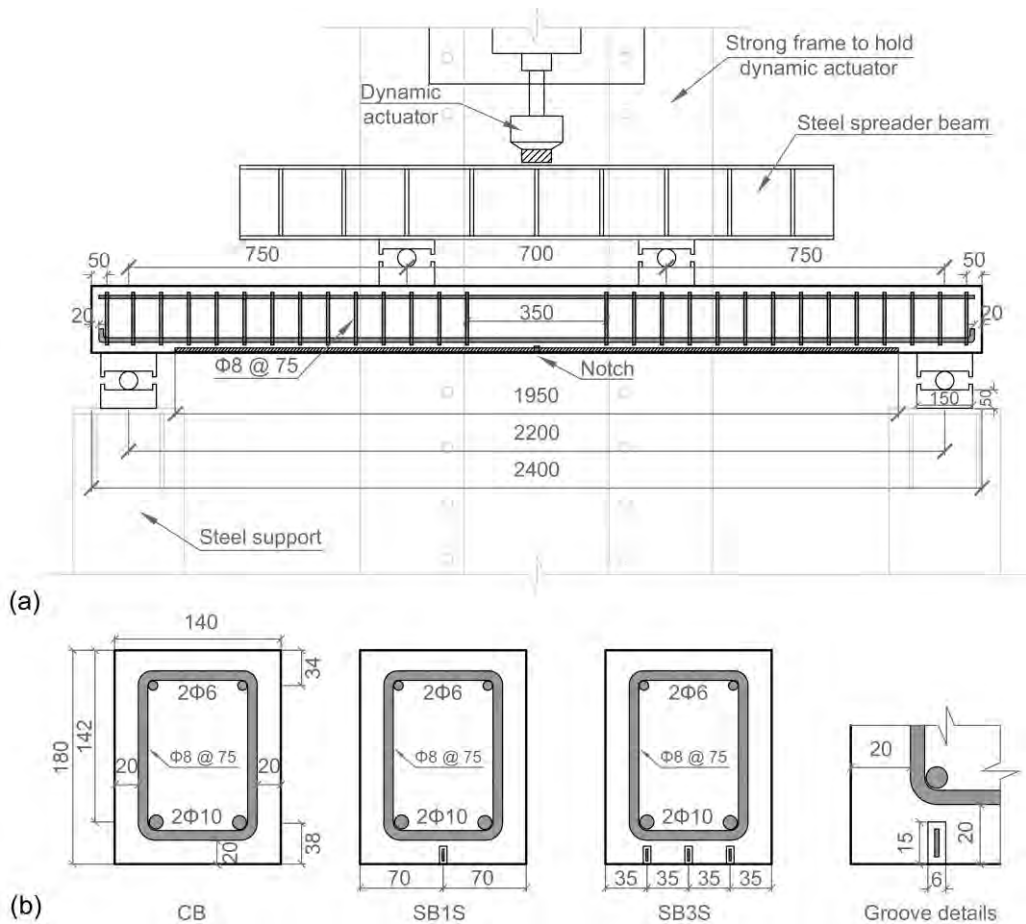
Four-point bending test configuration: (a) Test setup and (b) Cross-section details (all dimensions in mm).
